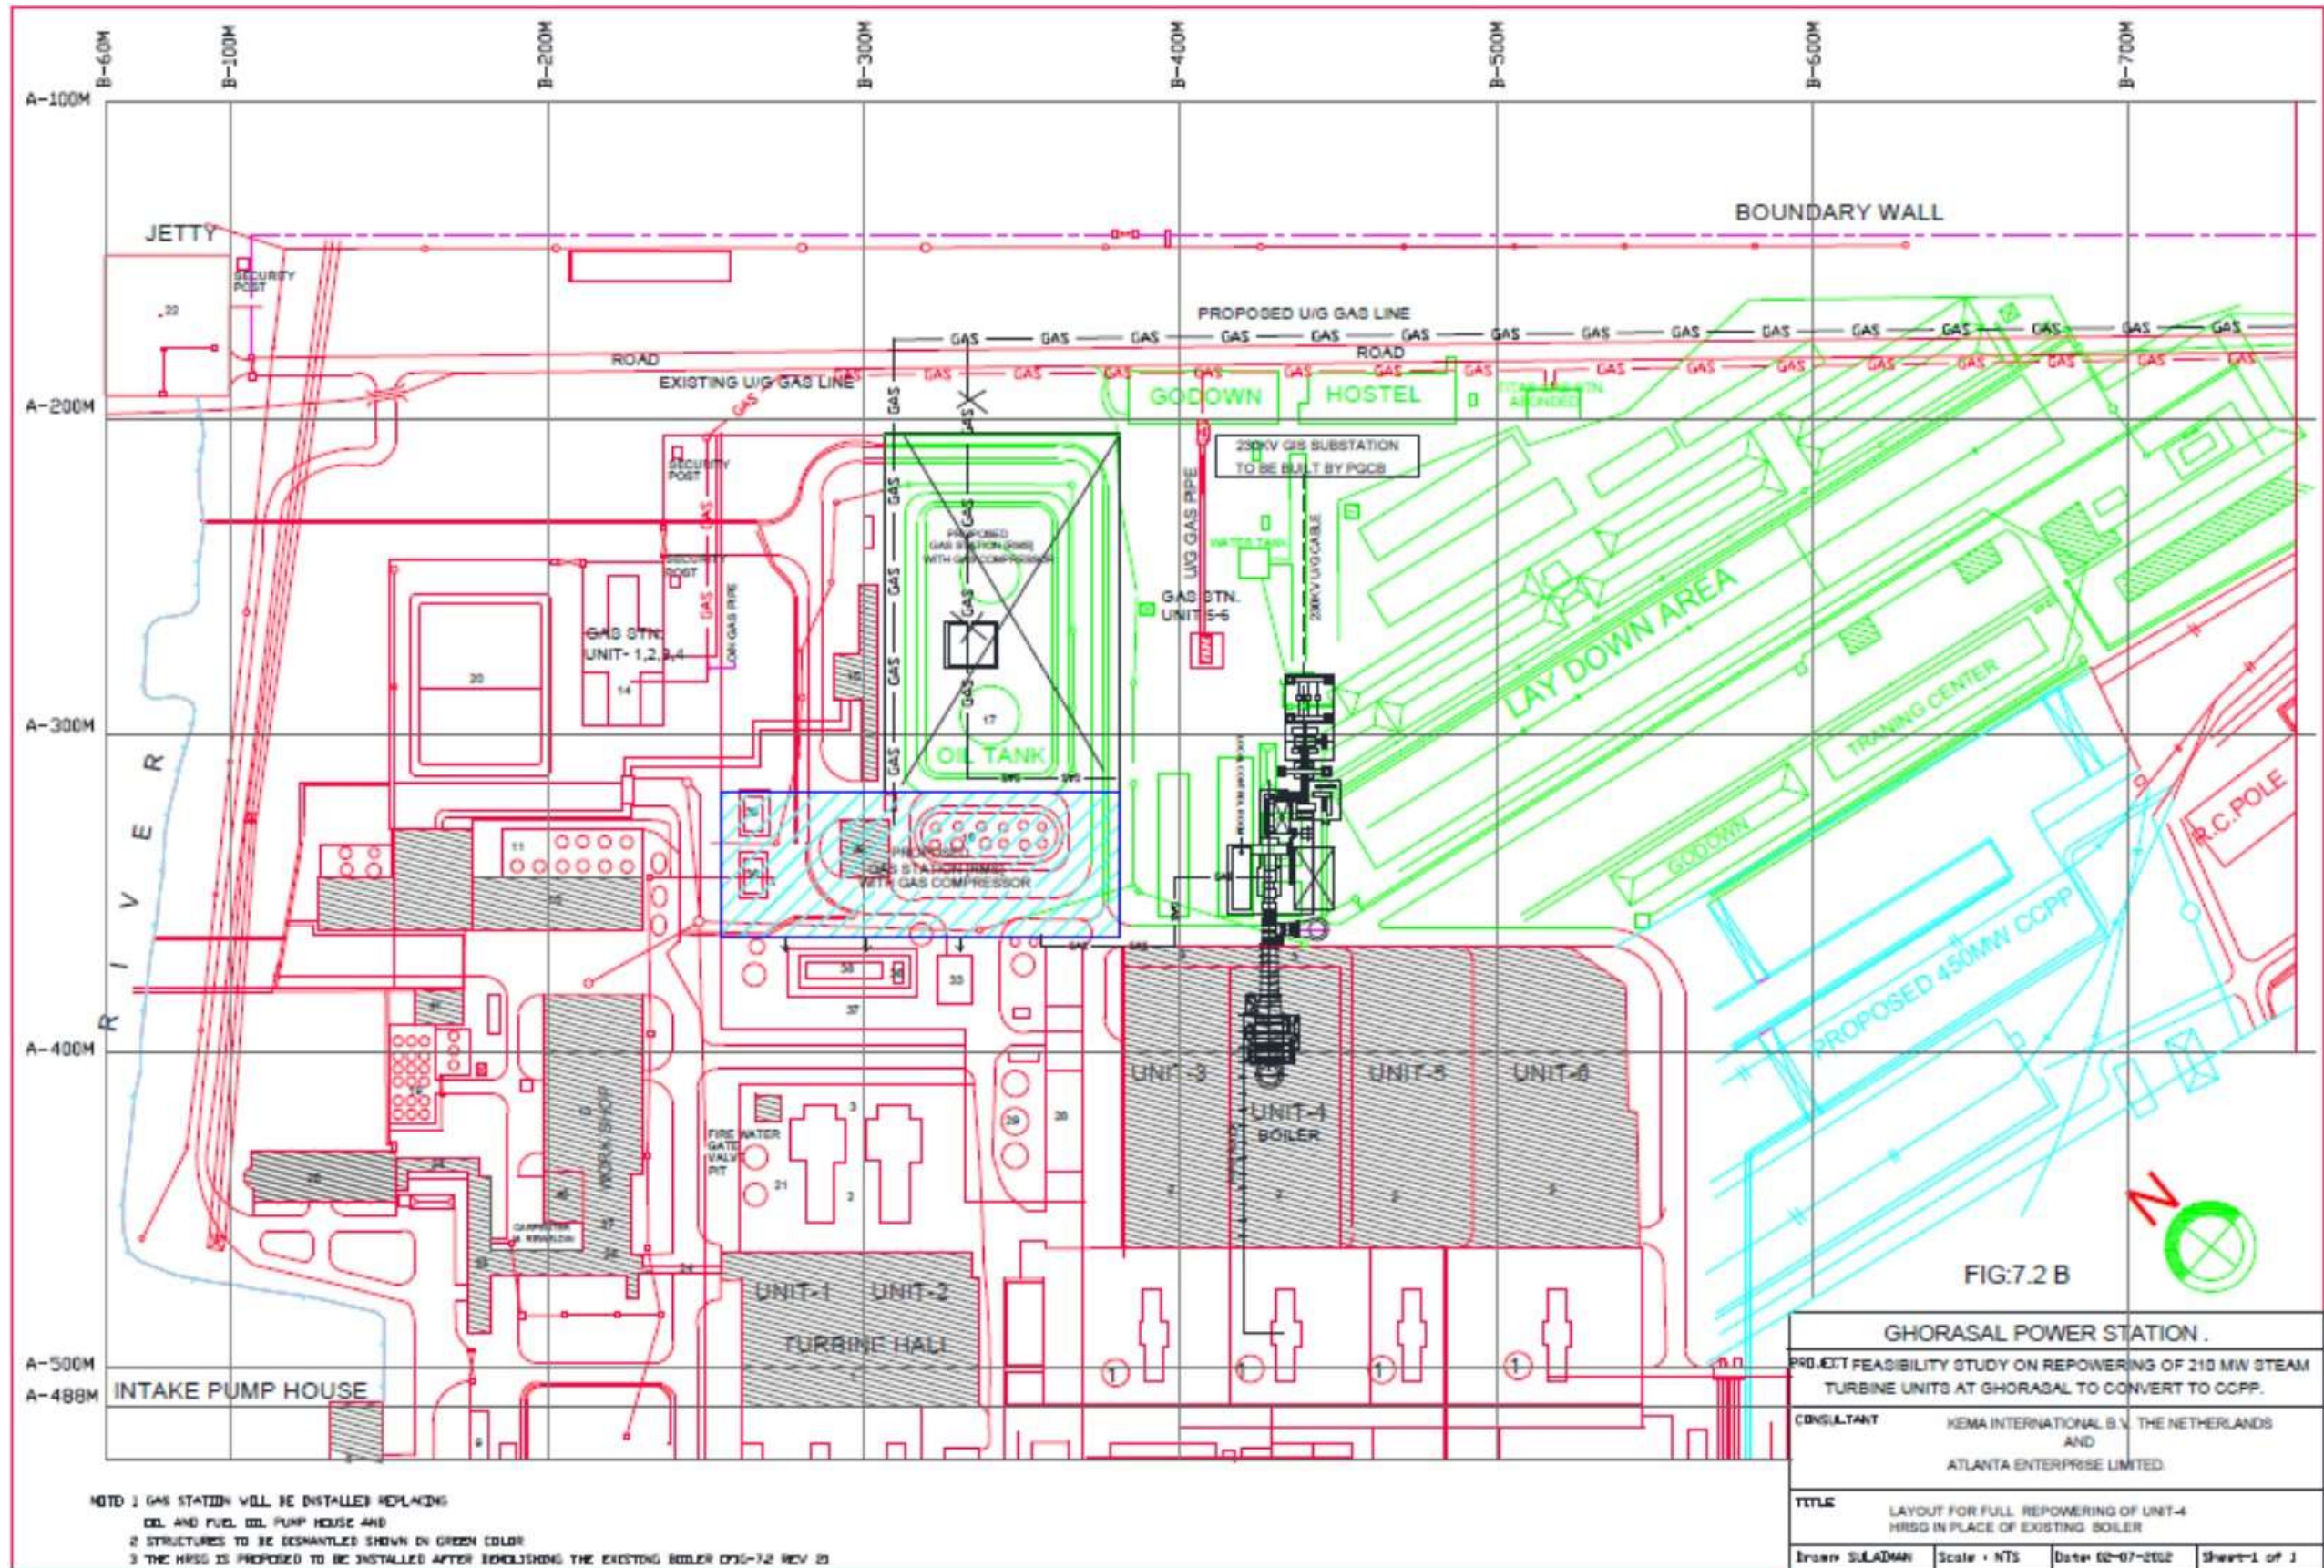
Full Repowering 1:1:1 configuration layout plan for Unit 4
